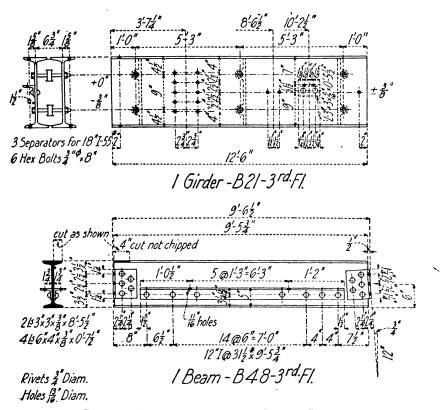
STANDARD DETAILS FOR ROLLED BEAMS.
